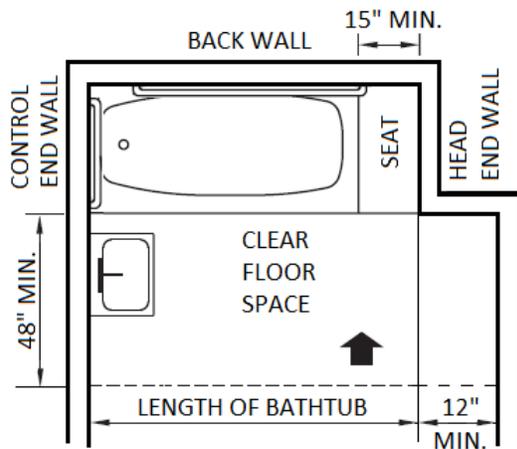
A-9E—CLEAR FLOOR SPACE AT BATHTUBS
